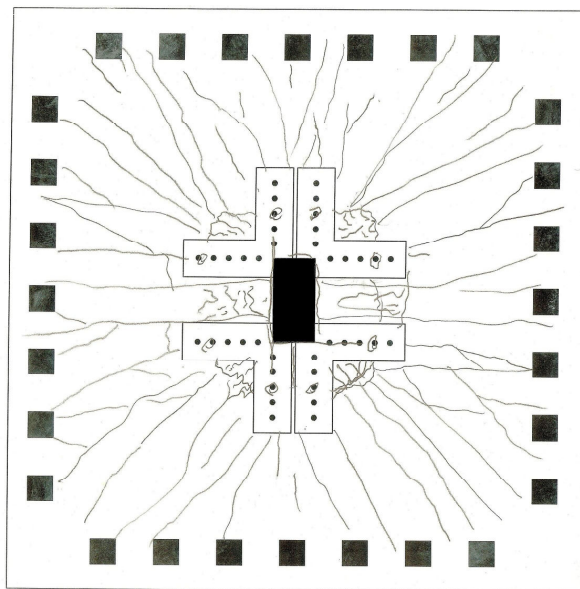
Failure surfaces and crack patterns of specimen R3
